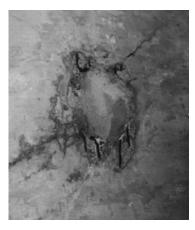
Sealed ventilation openings in Crematorium I ceiling. These openings housed circular vents used to replace the air in the gas chambers.
